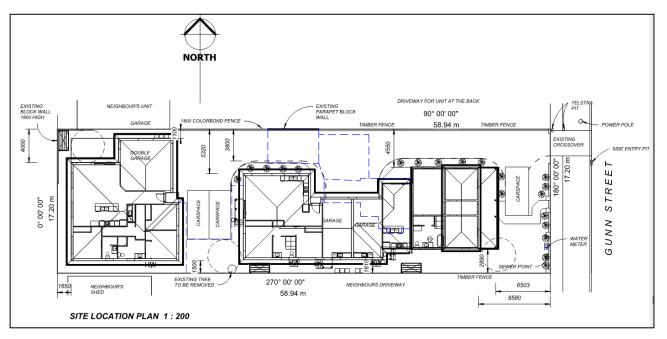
Site plan (Weed Drafting & Building Consultants Pty Ltd, 2023)
